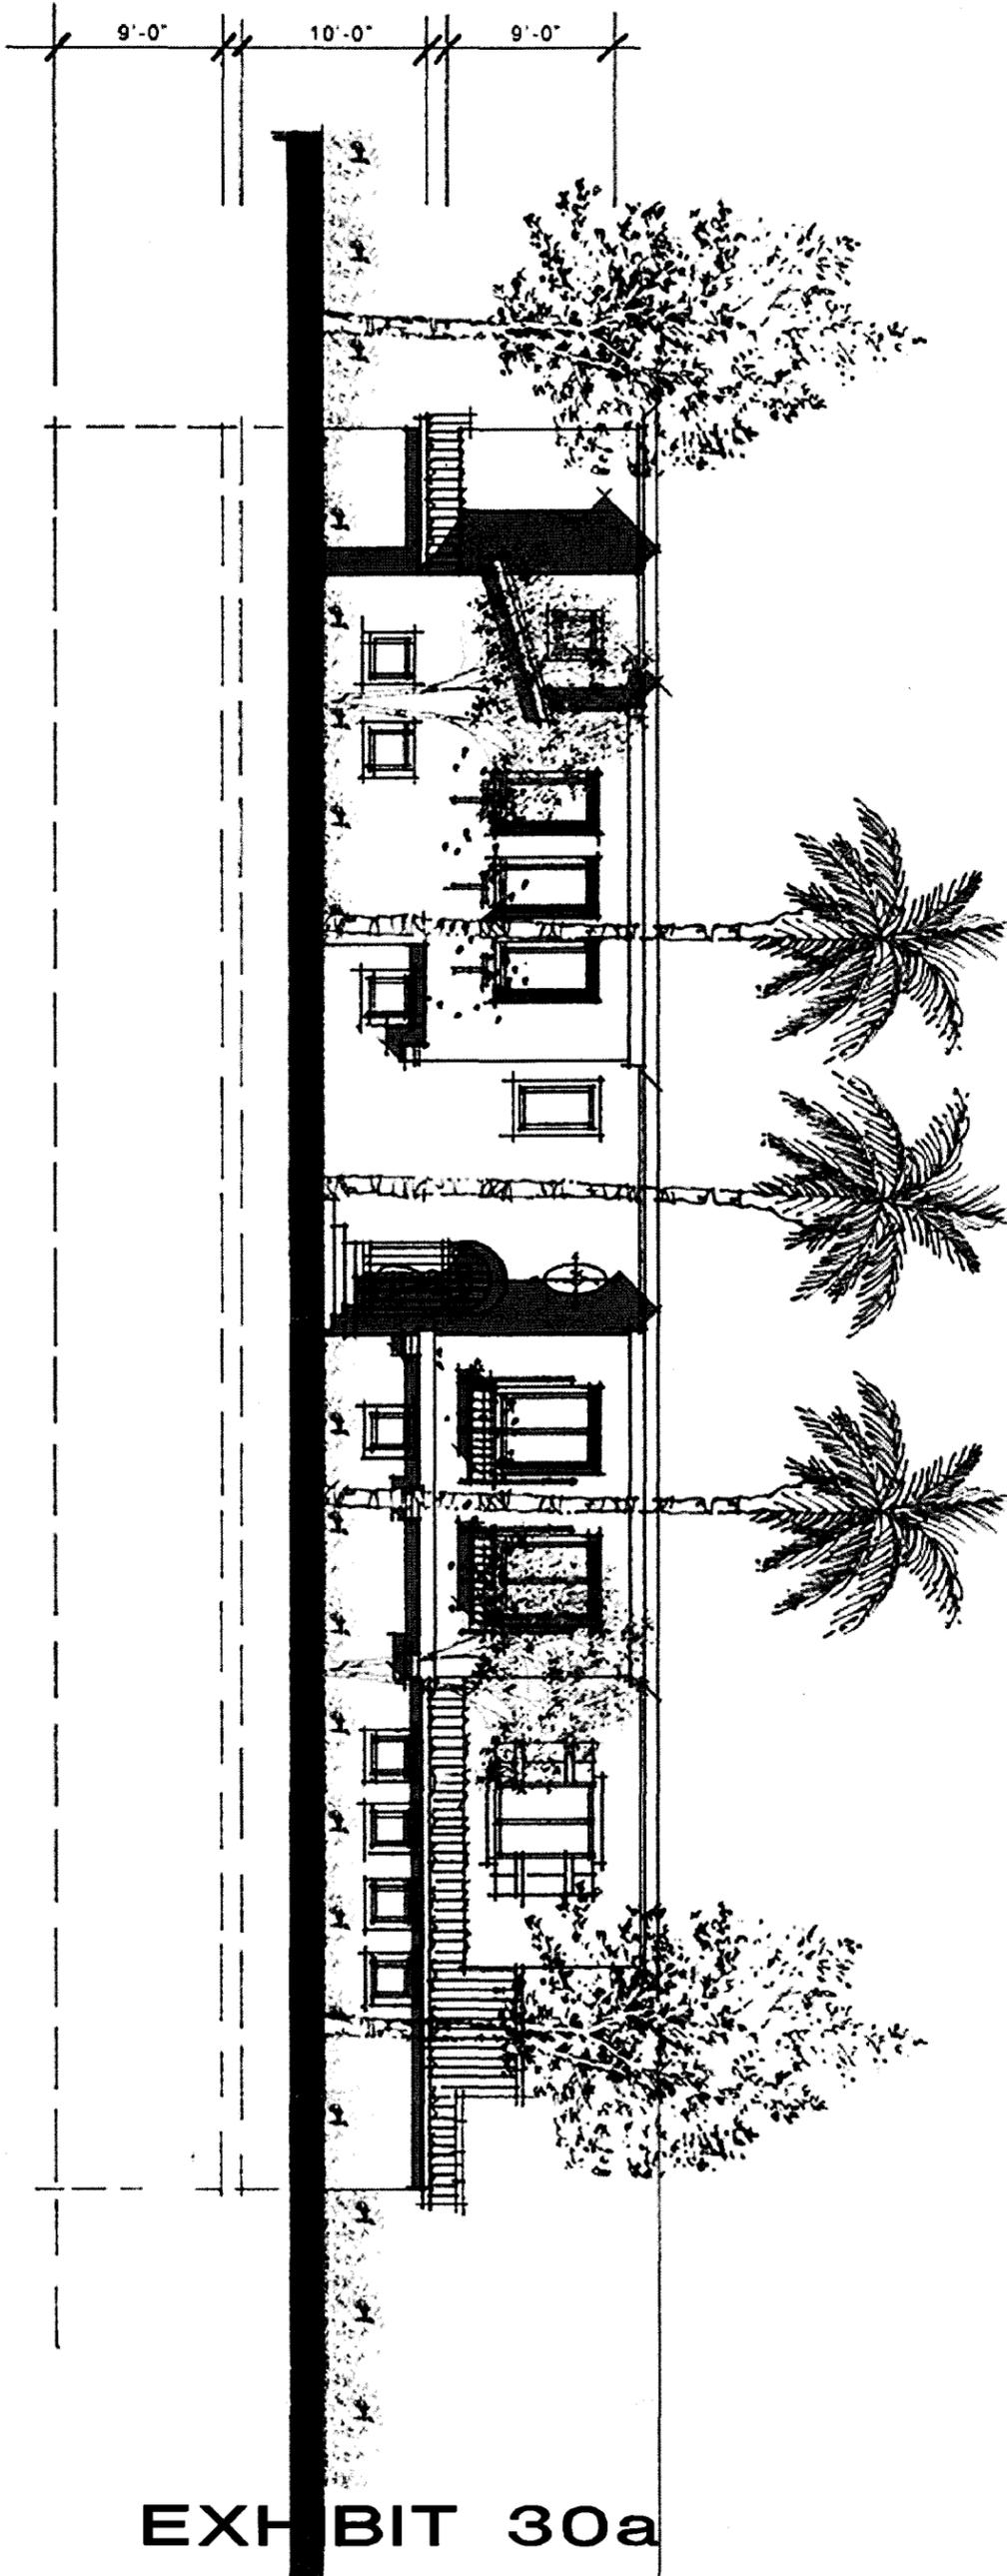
through 33 detail the proposed architectural designs for Planning Area 3. These include exterior elevations as well as interior floor plans. The descriptions below are meant to supplement the visual detail provided by the exhibits that follow.
